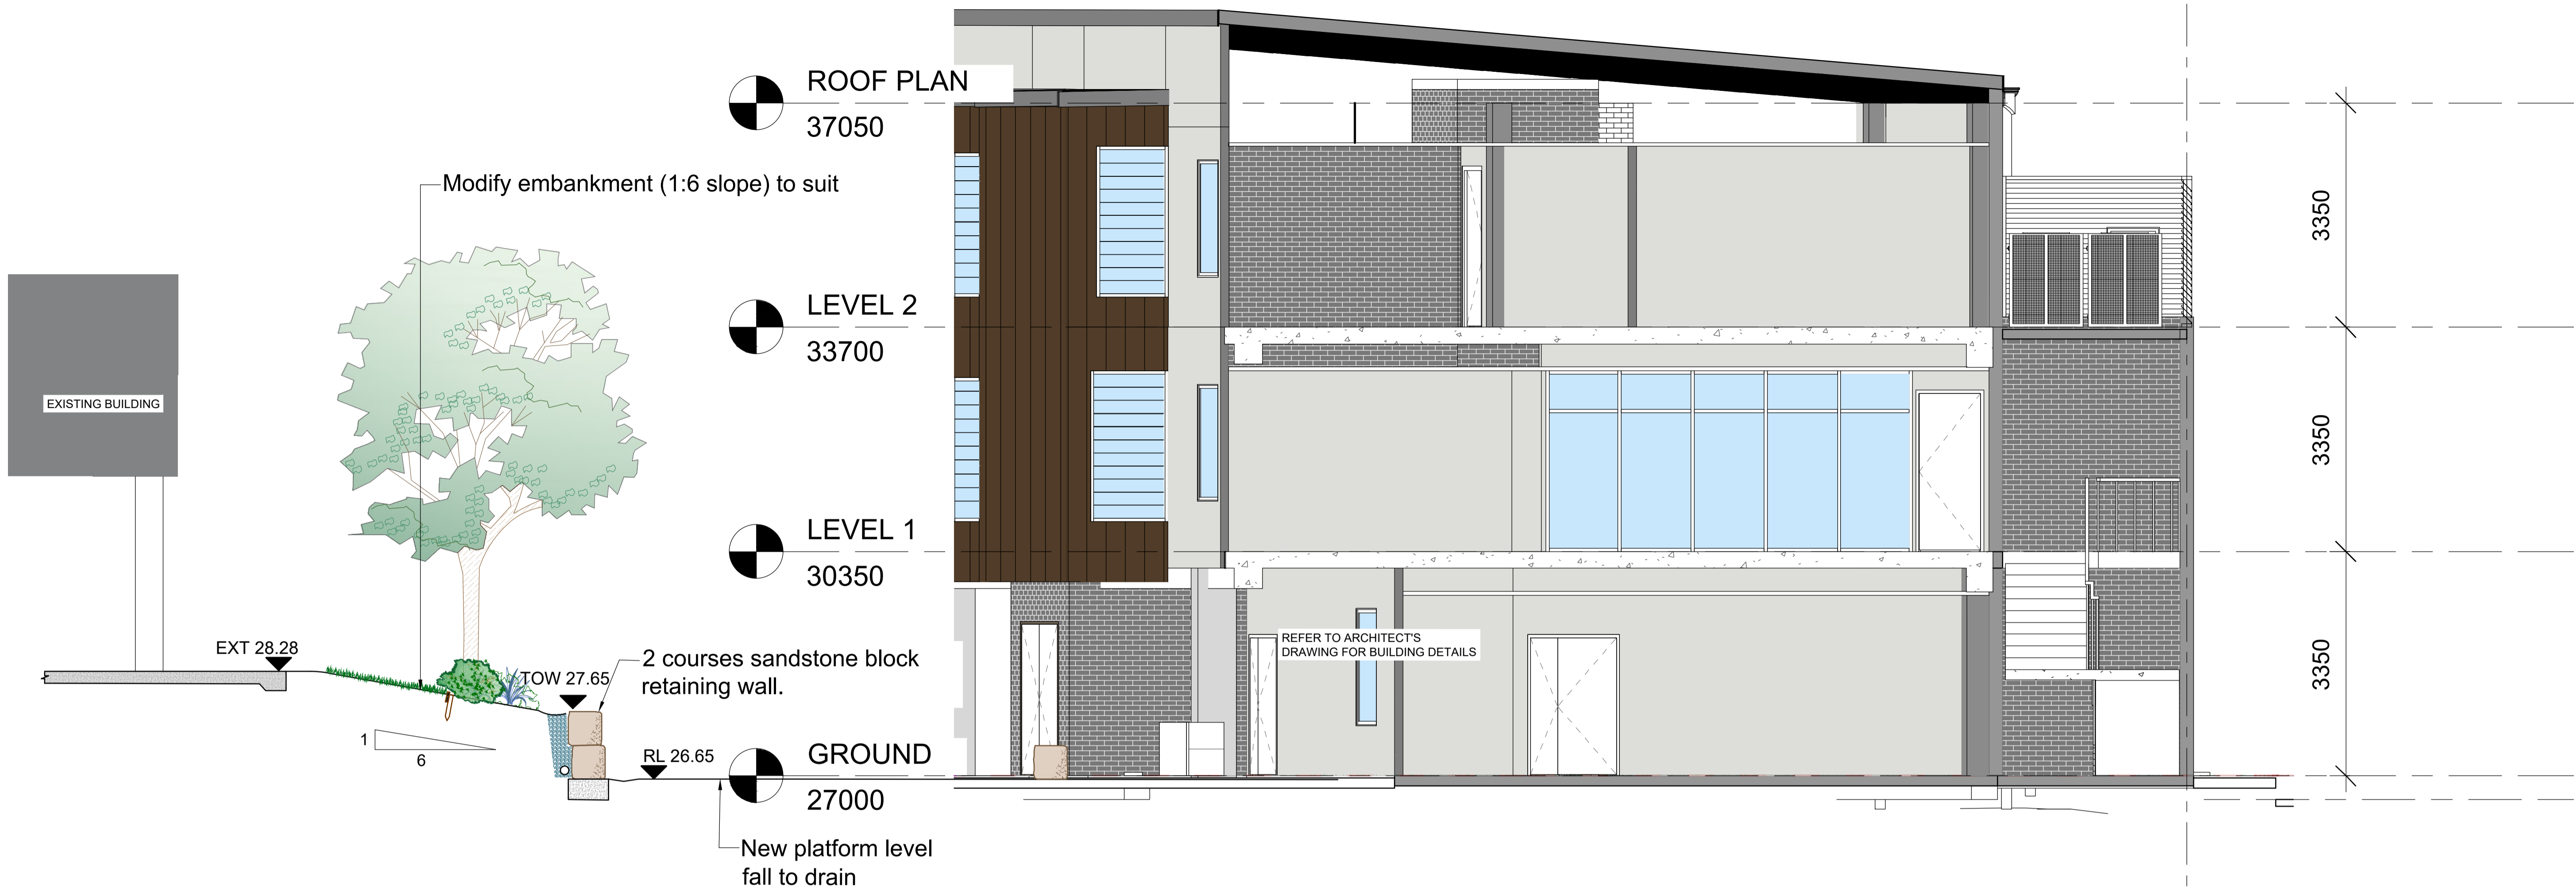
NATURAL SANDSTONE RETAINING WALL
